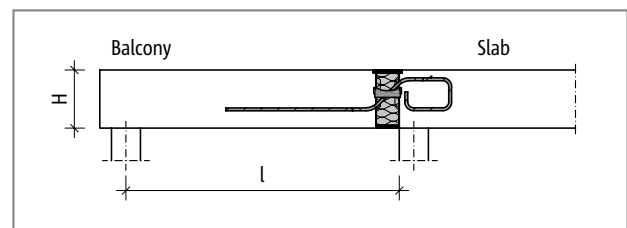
Schöck Isokorb® T type Q-E-W-V4 up to V5: Static system
